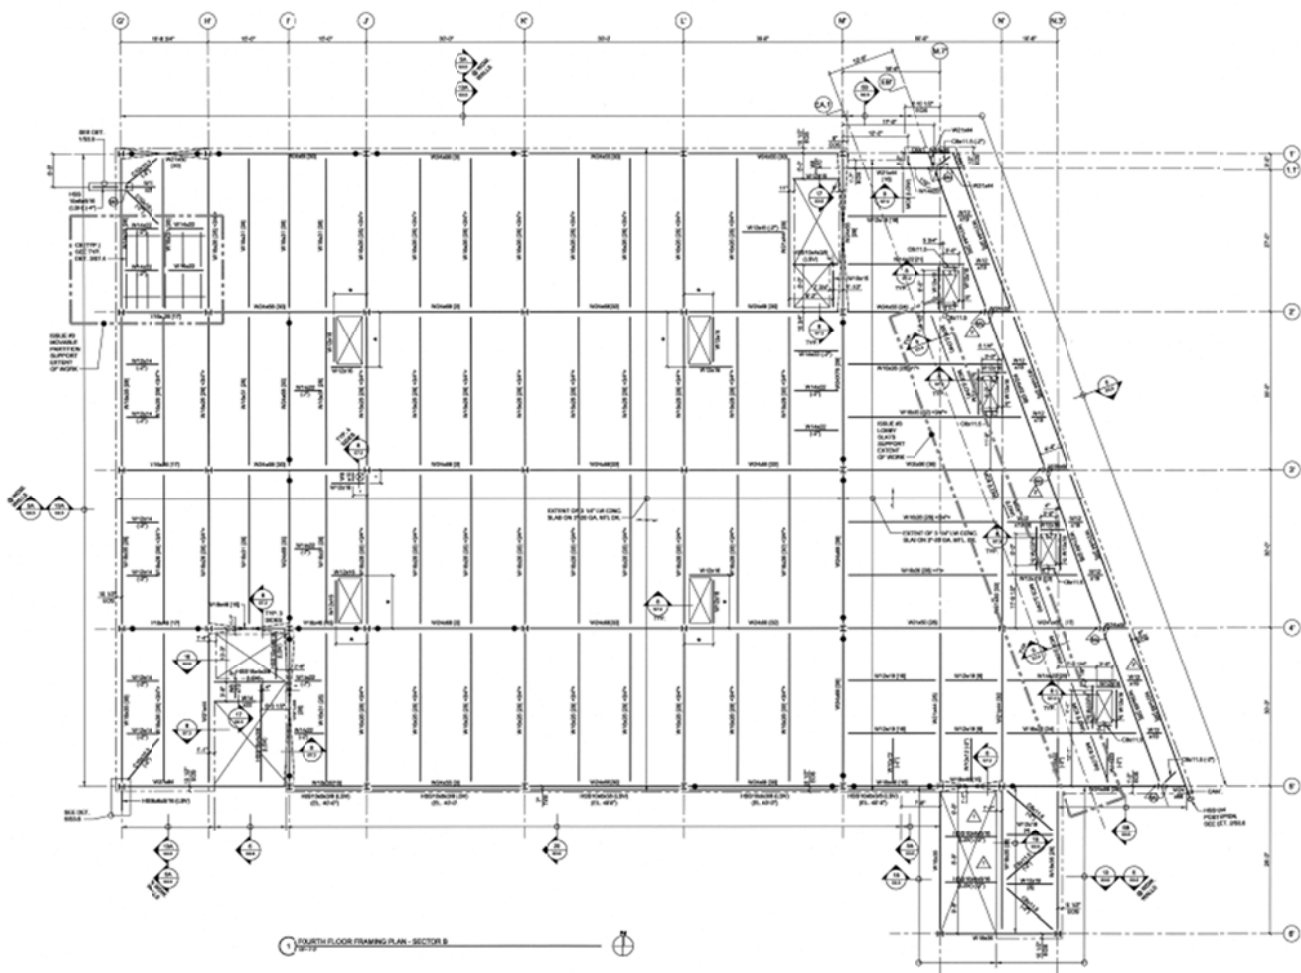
Typical framing layout (Central Tower) Floors two – four (Courtesy of EwingCole)
